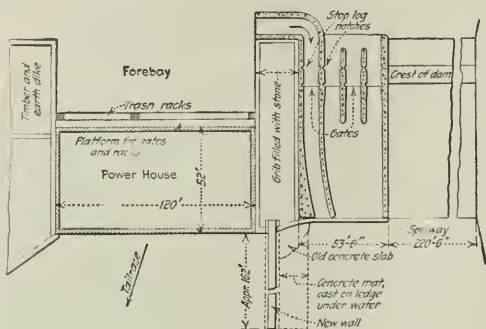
TIMBER CRIBS AND NEW DIVERSION WALL
